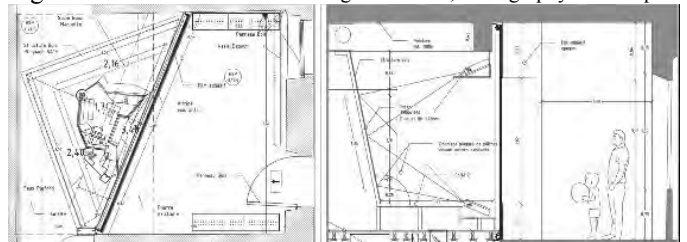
ROOM O.03 - Floor plan+ tech solutions for display system
